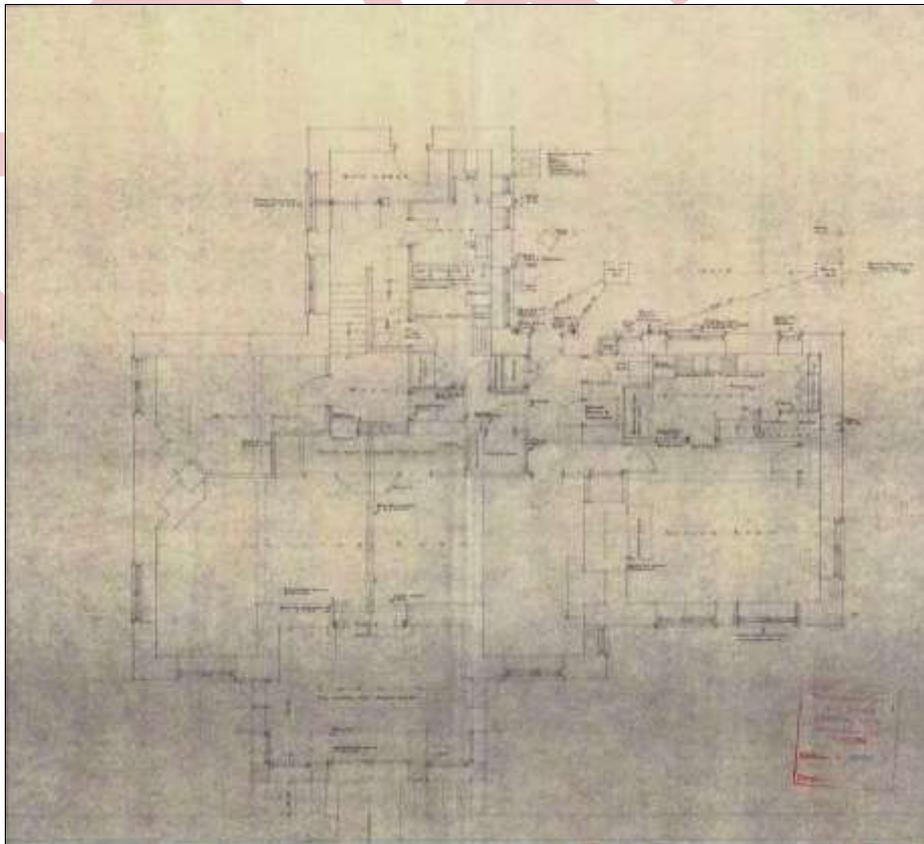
THE 1958 GROUND FLOOR ALTERATIONS PLAN FOR LILLYCOMBE HOUSE (AS PROVIDED BY AGENT).
